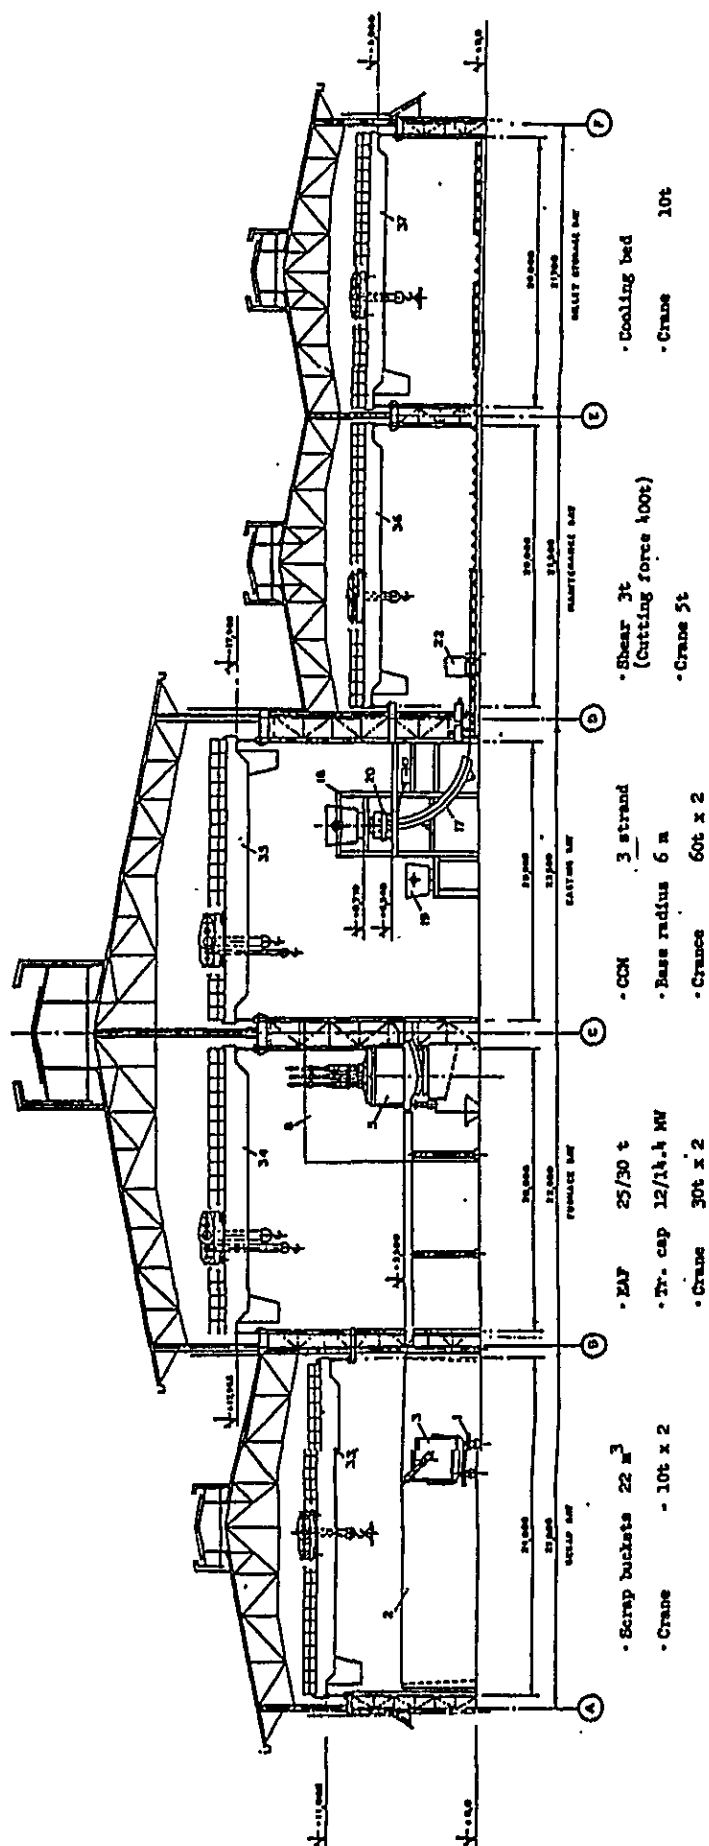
Typical Cross Section of the Electric-arc Furnace Shop (Steel Melting Shop)
